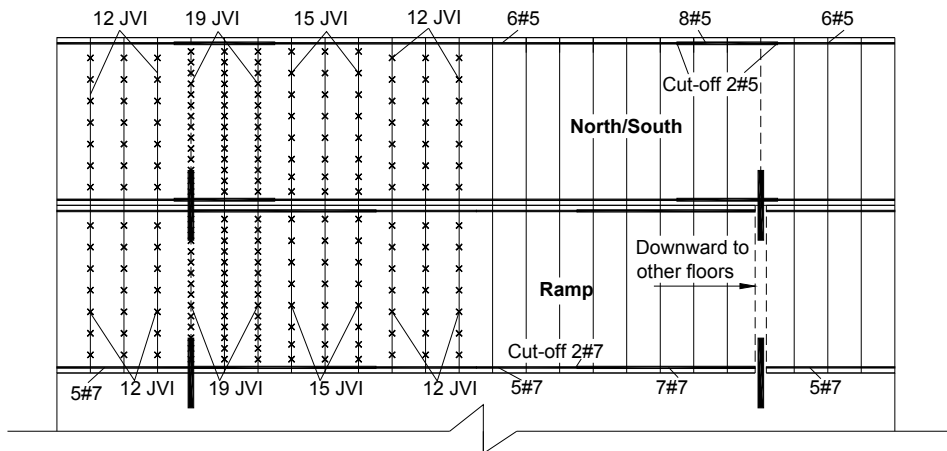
Diaphragm reinforcement at other floors for example 2B.
